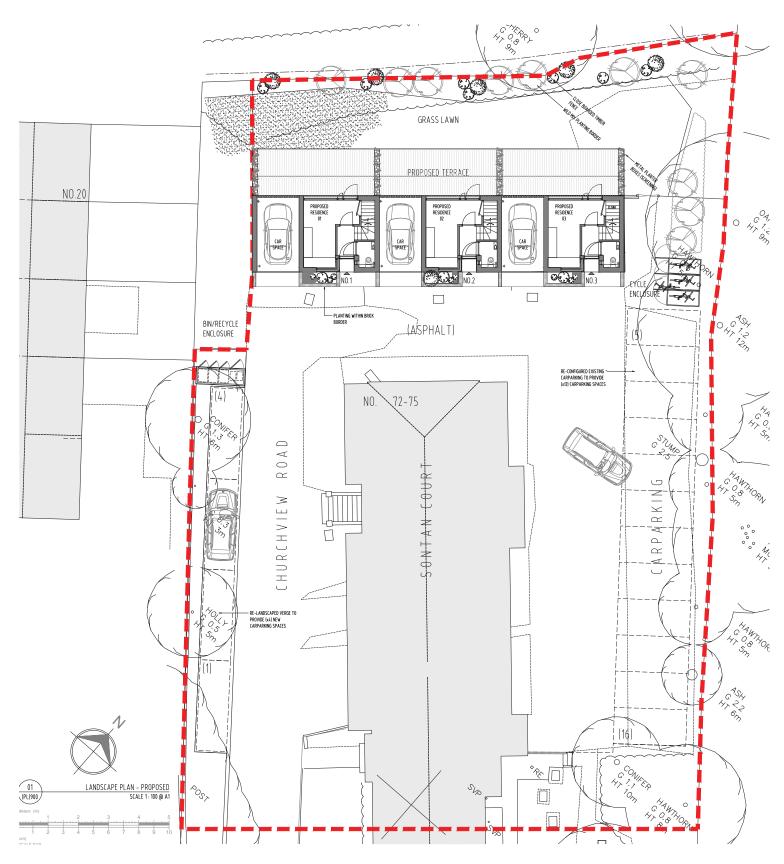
PROPOSED SITE PLAN WITH LANDSCAPING
